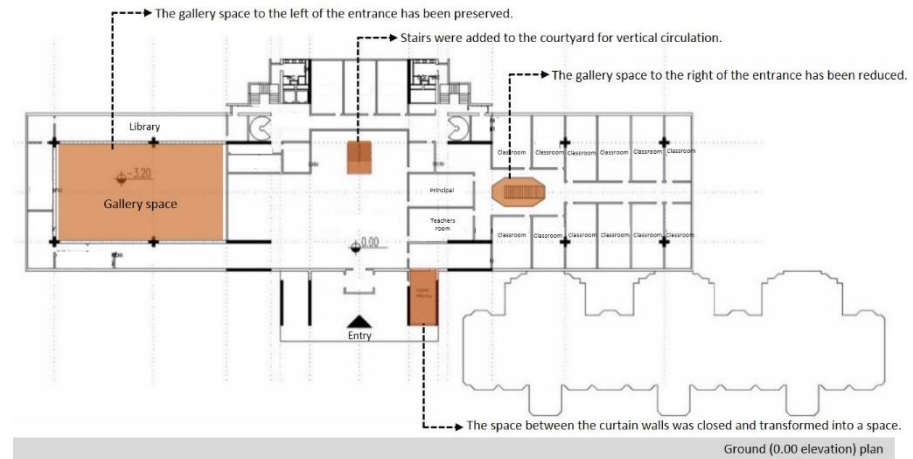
Spatial changes on the ground floor [Accessed from plan (Kaymak, 2019)]
